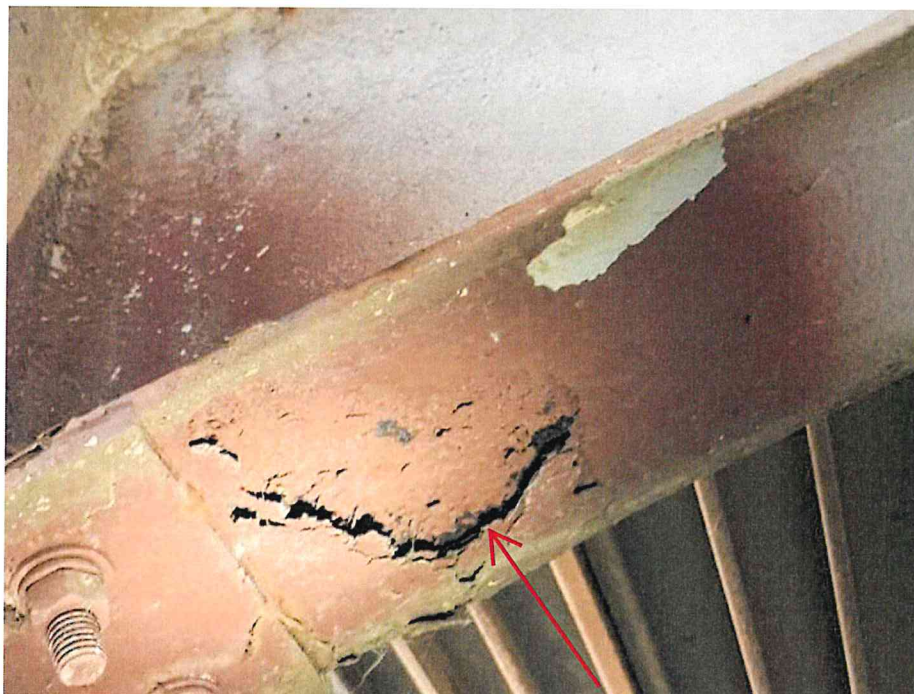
Photo showing severe corrosion at beam flange (indicated by red arrows)
